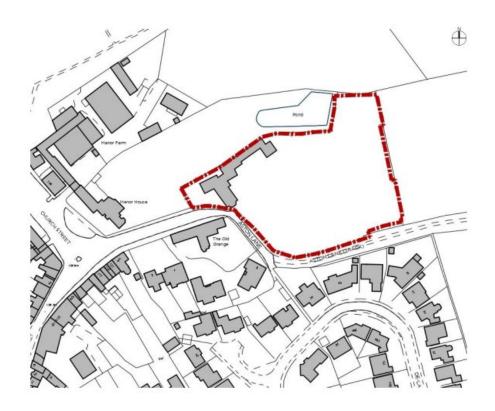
Site location within Burbage and detail of the existing site (Plans provided by client)
